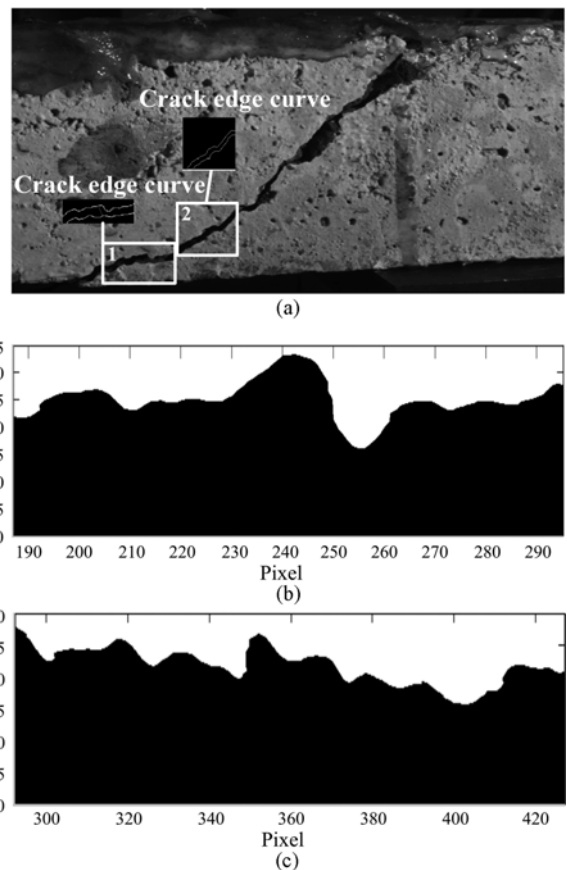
Crack Width Inspection Results of Specimen 3: (a) Inspection Zone of Crack, (b) Crack Width Curve of Zone-1, (c) Crack Width Curve of Zone-2
